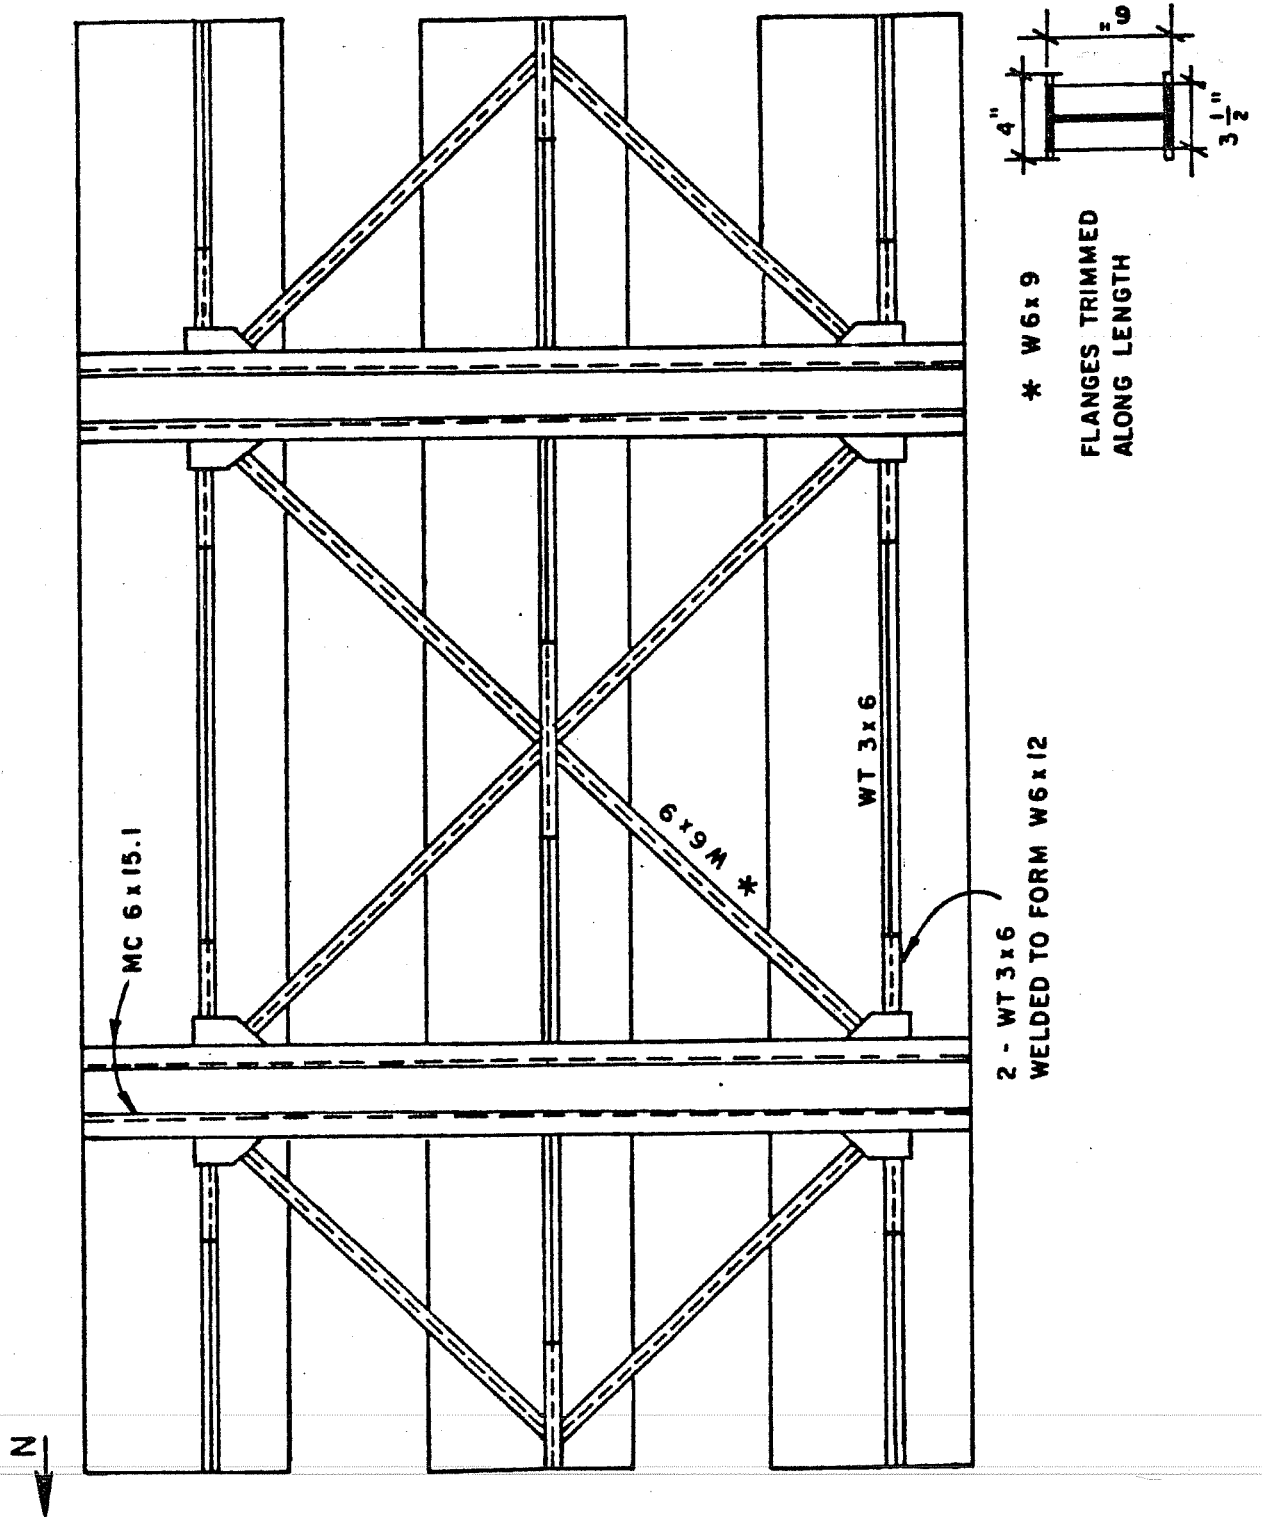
Prototype reinforced concrete frame specimen strengthened with X-bracing steel sections (Ref. 51).
